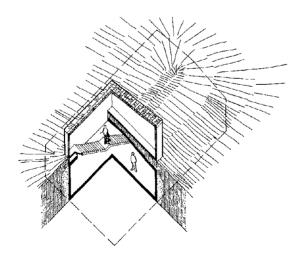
Type D-5 Underground (Below Grade) Dwelling
